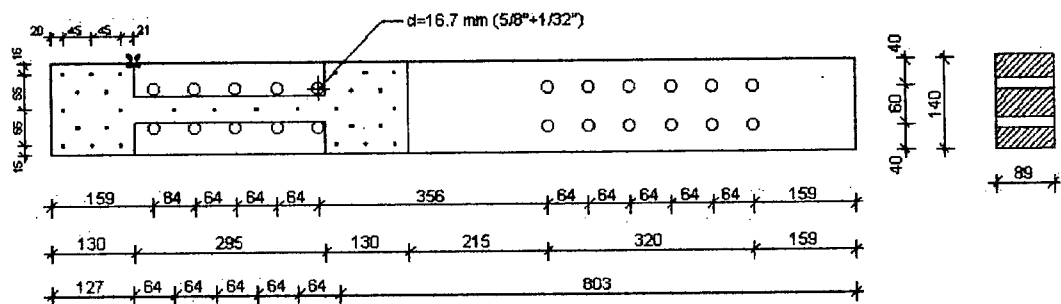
Glued-on plate reinforced specimen layouts (1.2mm plate, epoxy)
